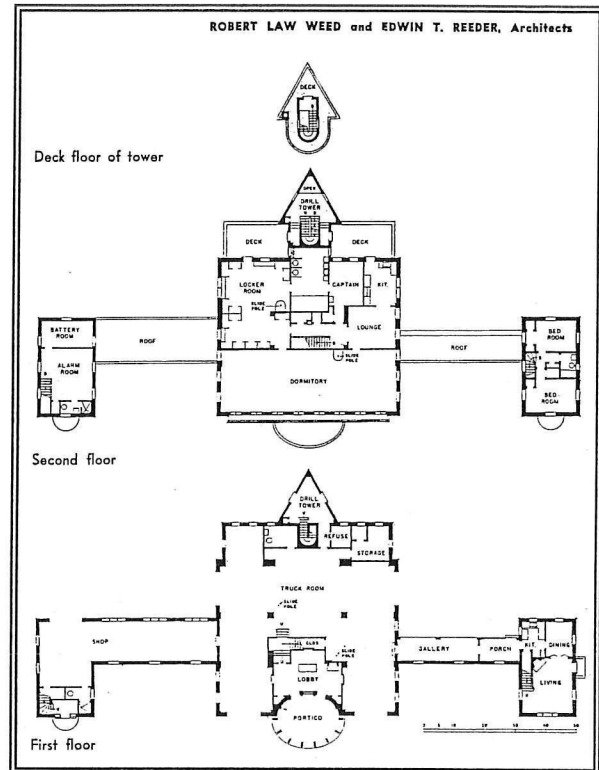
Original 1939 floor plan of the Dade Boulevard Fire Station.
